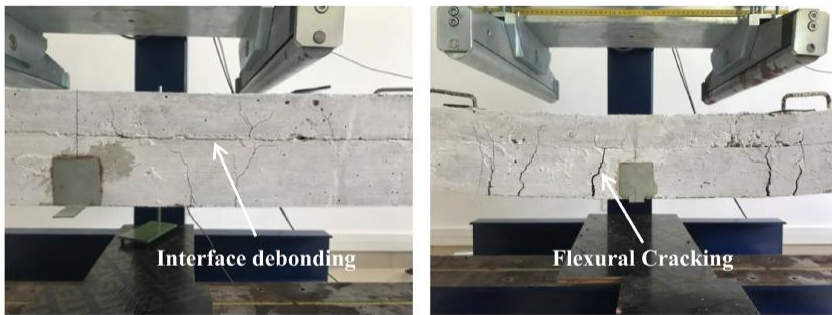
Two types of slab failure modes (Mohamed et al., 2020)
